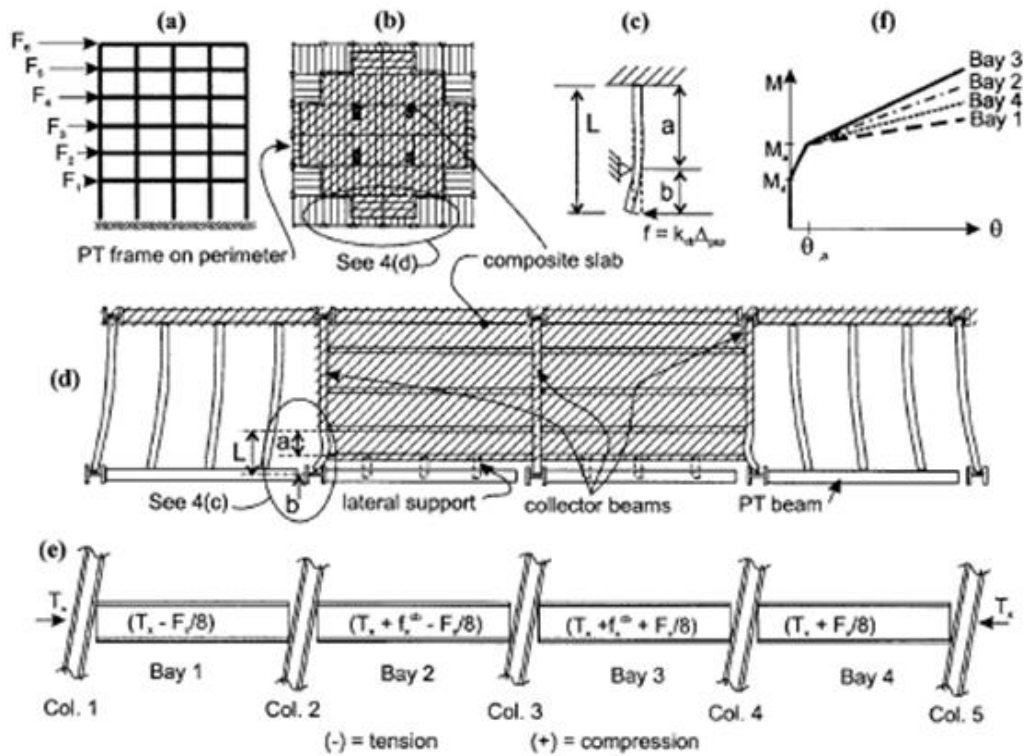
(a) Floor inertia forces on building elevation; (b) plan of hypothetical building; (c) deformation of collector beam; (d) interaction of SC-MRF with gravity system; (e) beam axial forces (P) on each bay of floor x ; and (f) idealized moment-rotation plot of the connection moments on floor x . (Garlock et al 2007)
